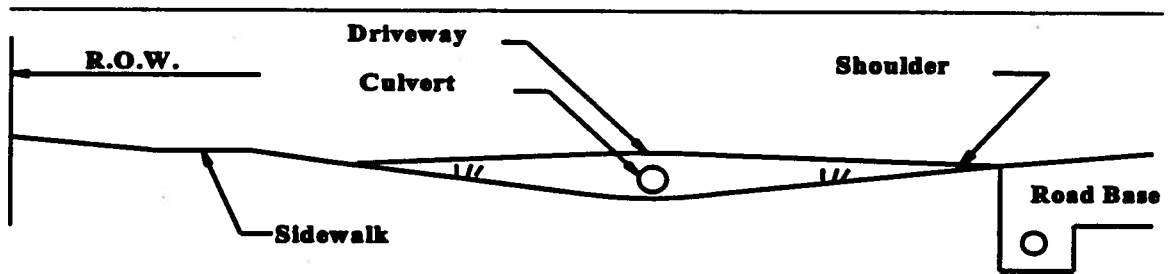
Typical roadside ditch drainage system with raised culverts
